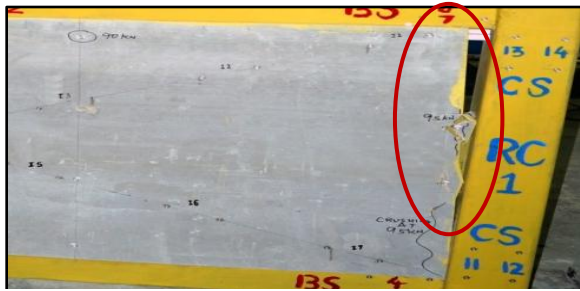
Separation of Infill at Tension Corner – Frame (2)
